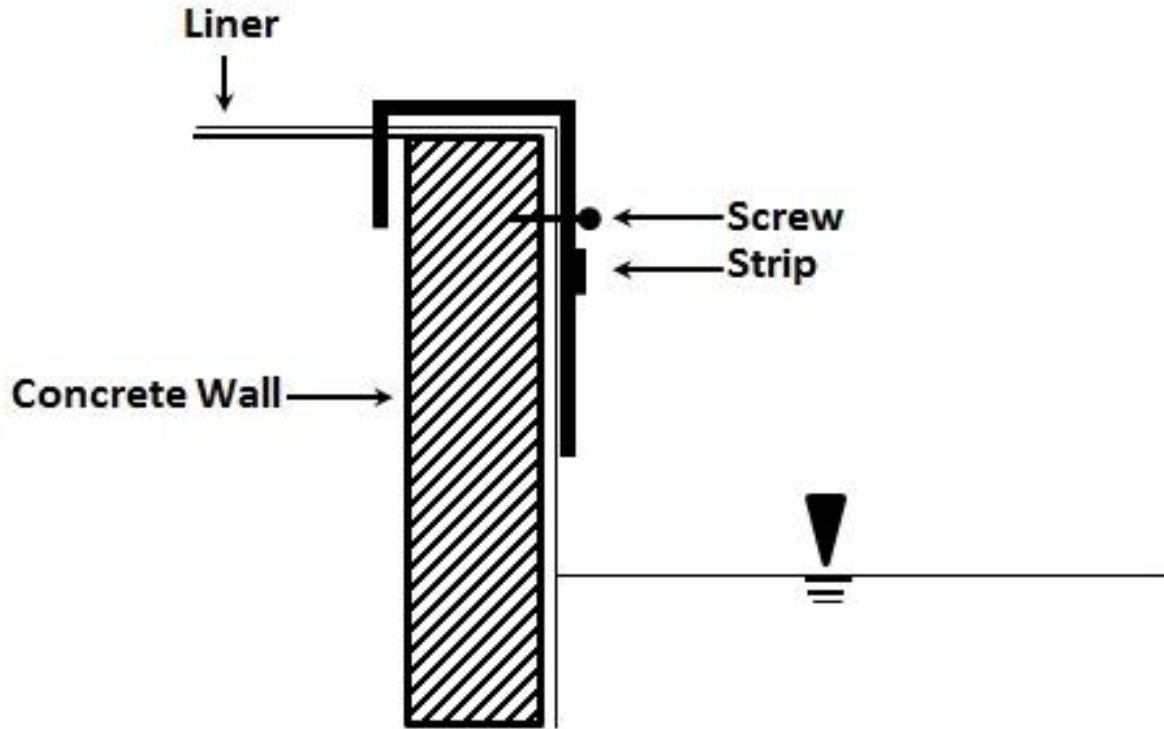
Sketch (not to scale) showing the method of securing geotextile liners to concrete retaining walls in ponds.
